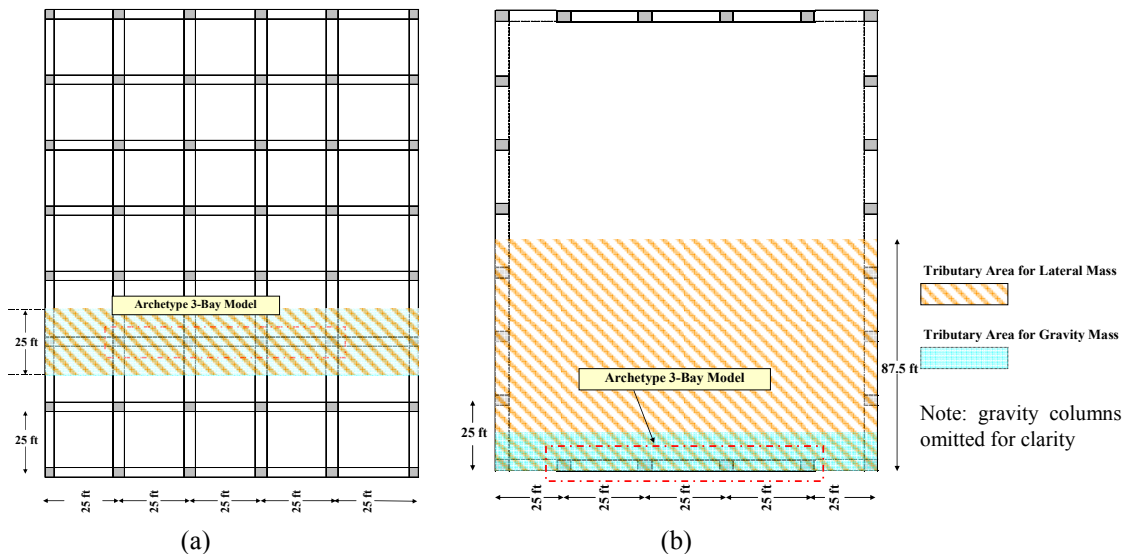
Plan view of (a) space frame and (b) perimeter frame systems. The 2- and 4-story buildings measure 125 ft x 175 ft. in plan. The 8 and 12-story buildings are 125 ft. x 125 ft.
